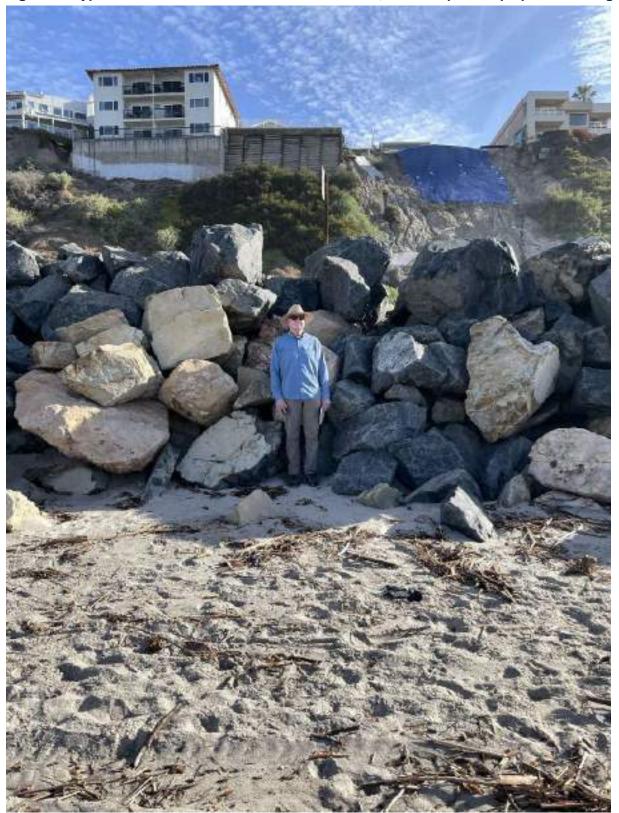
Typical current site conditions from lower beach, over-steepened riprap central image
